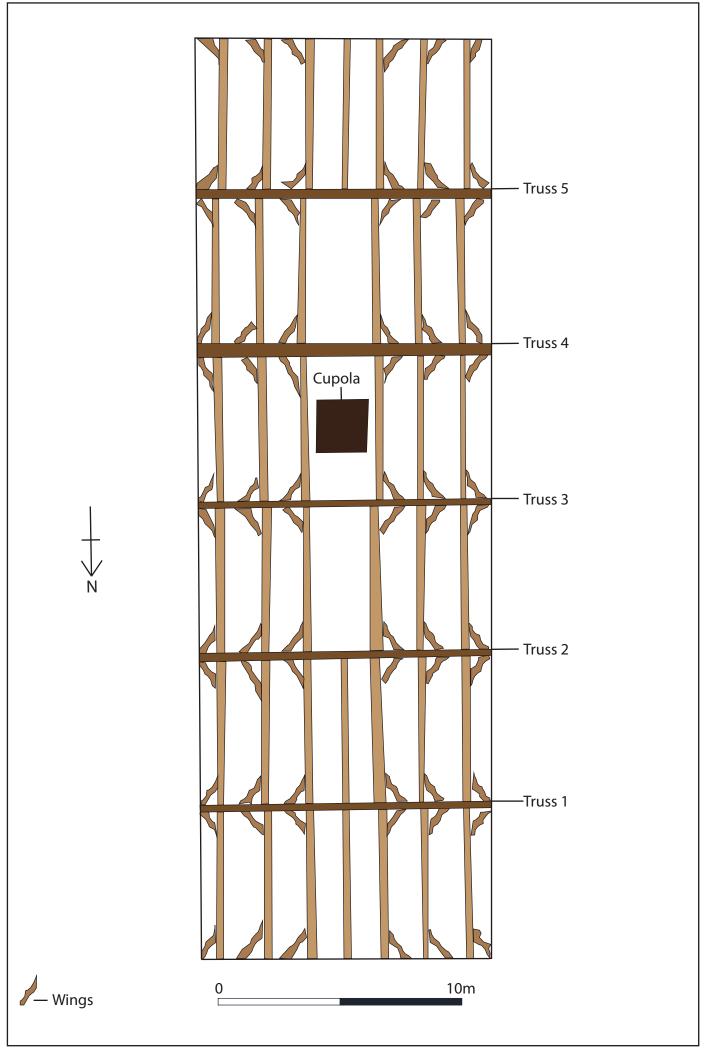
Detailed Plan of Old Grammer School Hall roof construction
